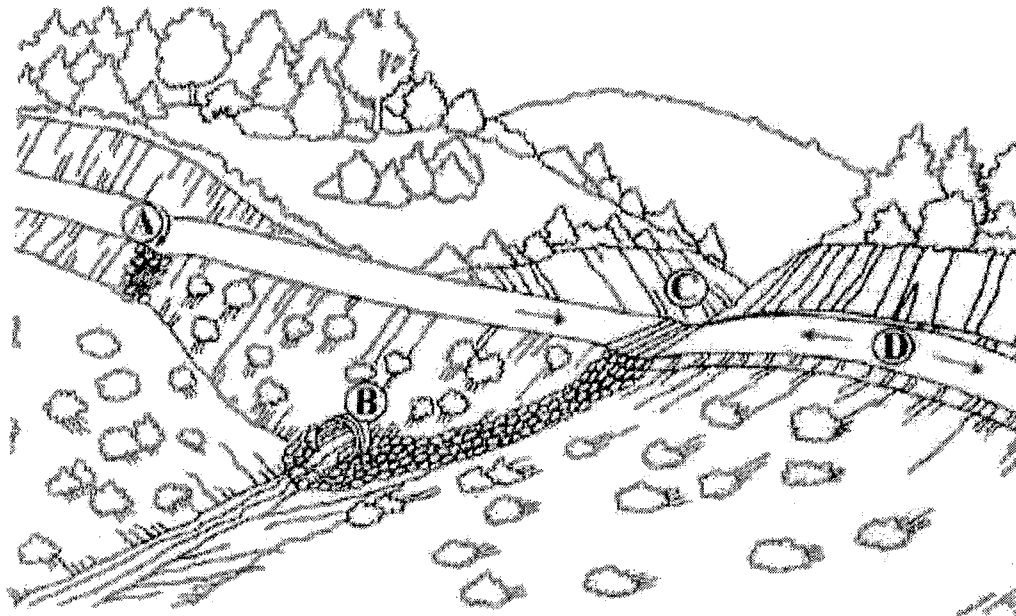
Critical dips or dipped crossing fills should be centered near a stream crossing's down-road hinge line, not over the centerline of the crossing where overtopping could cause washout or severe erosion of the fill. If the stream crossing culvert (B) plugs, water will pond behind the fill until reaching the critical dip or low point in the crossing (C) and flowing back down into the natural stream channel. The down-road ditch must be plugged to prevent streamflow from diverting down the ditch line. For extra protection in this sketch, diprap armor has been placed at the critical dip outfall and extending downslope to the stream channel. This is only required or suggested on stream crossings where the culvert is highly likely to plug and the crossing fill overtopped. The dip at the hinge line is usually sufficient to limit erosional damage during an overtopping event. Road surface and ditch runoff is disconnected from the stream crossing by installing a rolling dip and ditch relief culvert just up-road from the crossing (A) (Keller and Sberax, 2003).
